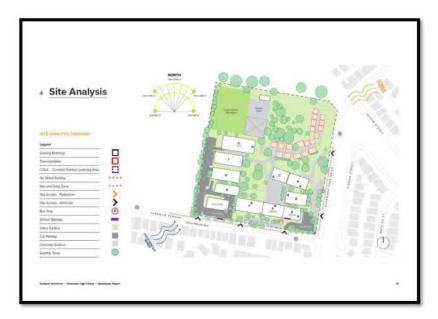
Existing site layout for Glenwood High School. (Source SINSW/Pedavoli Architects 2020).
